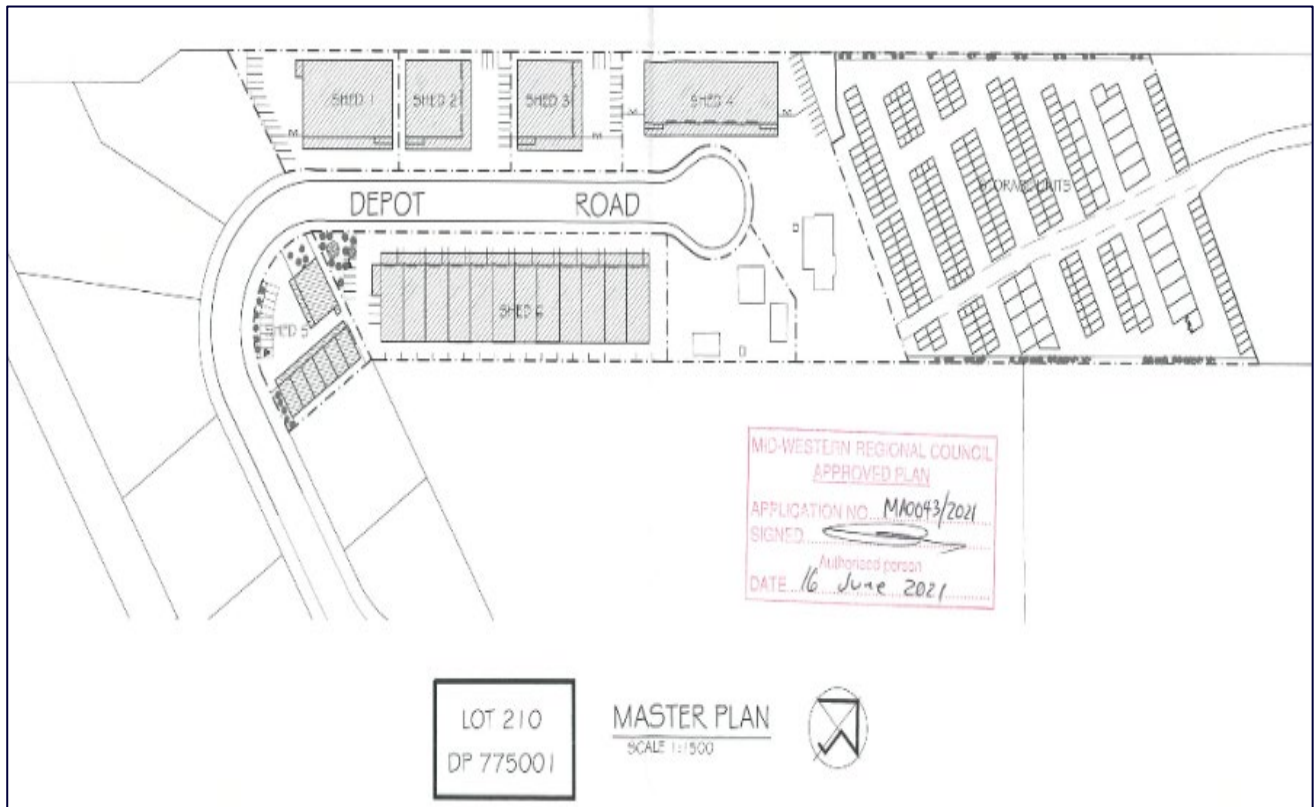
Modified layout approved by MA0043/2021 – 16 June 2021
